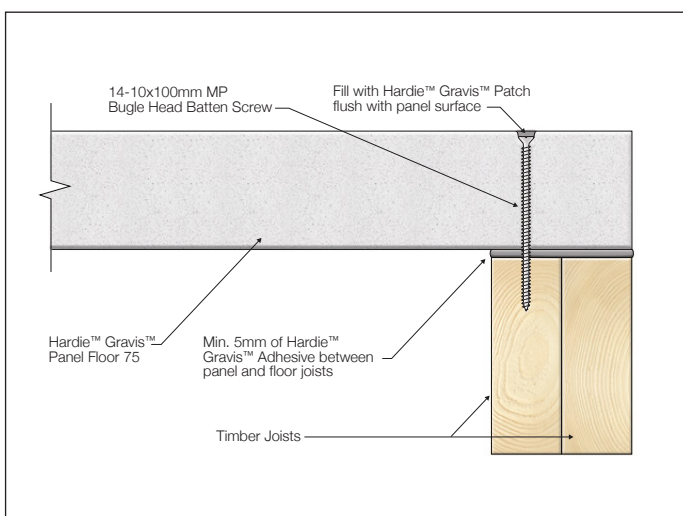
FIXING AT END PANELS TO TIMBER JOISTS
